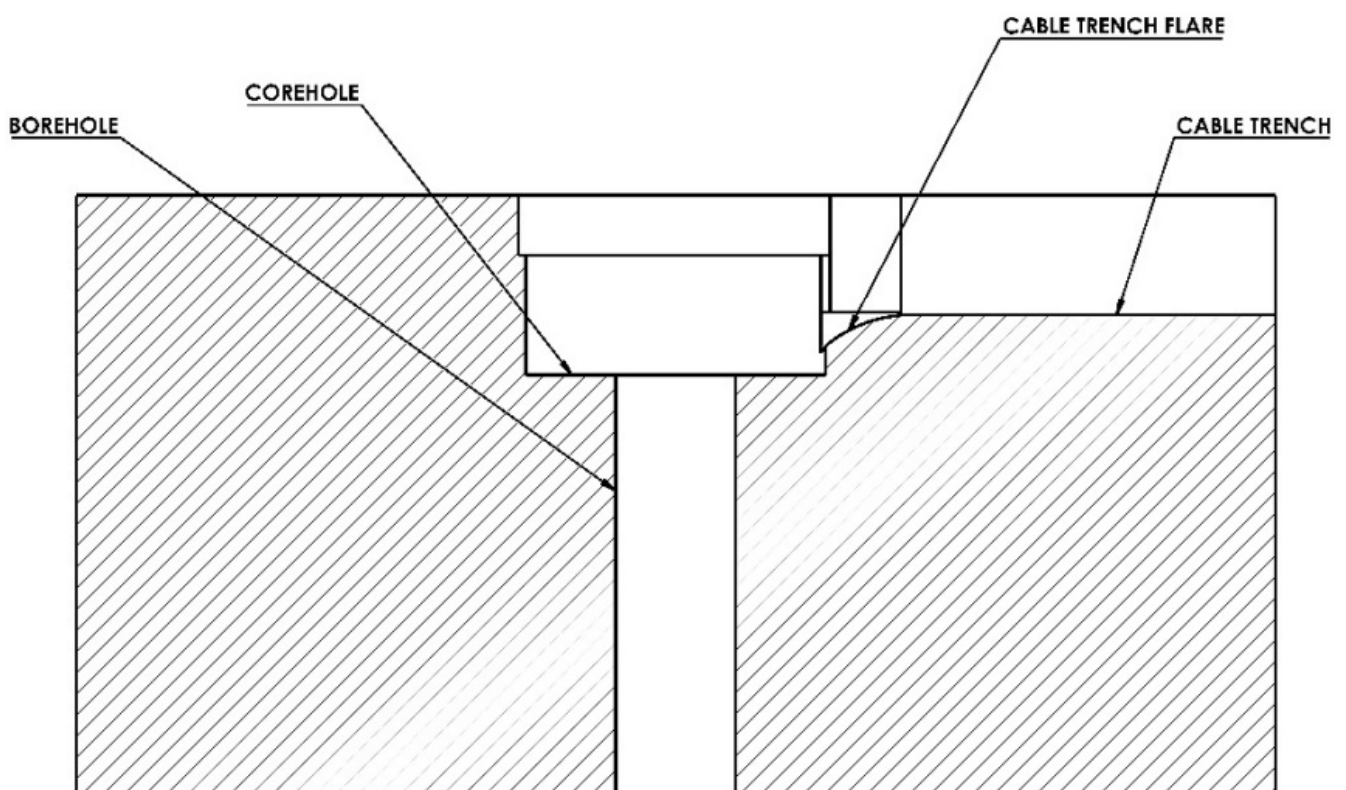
Flared slit trench meeting corehole, elevation view (depiction)
